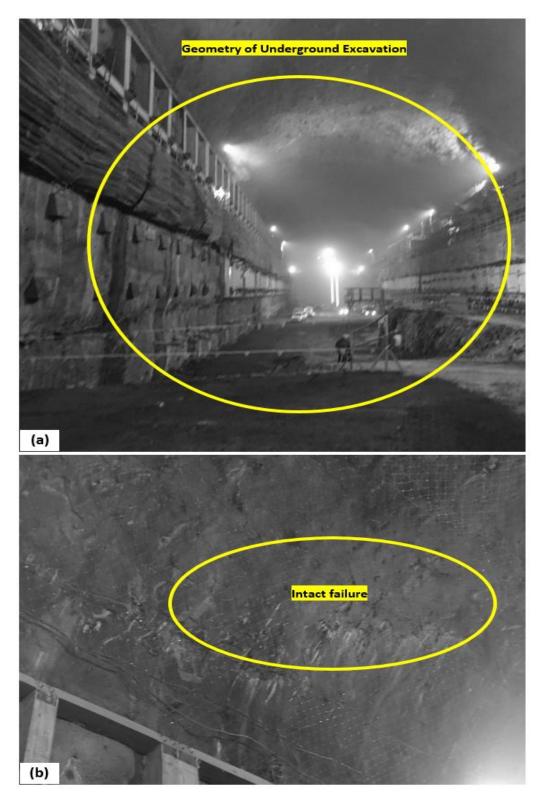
(a) The geometry of underground cavern excavation, (b) Intact rock failure
